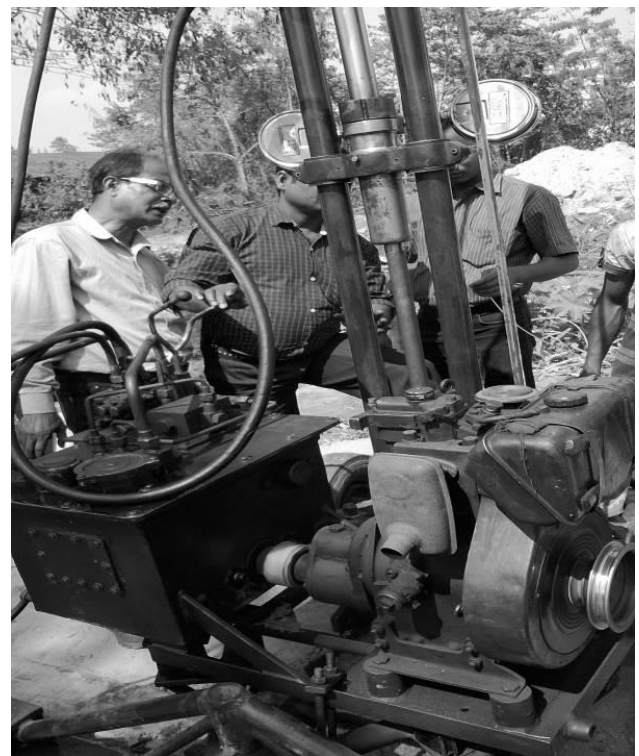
Pushing the dilatometer blade using cone penetrometer equipment.
